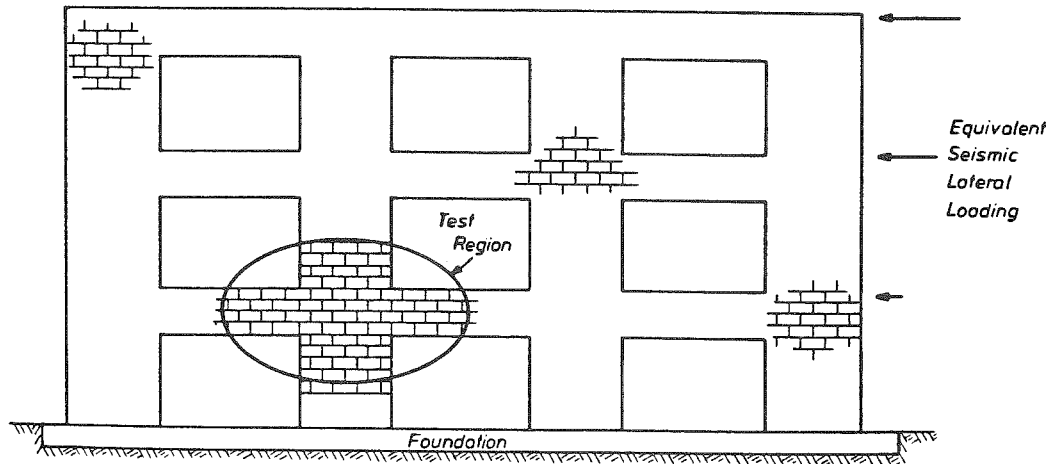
MASONRY FRAME UNDER LATERAL LOAD
